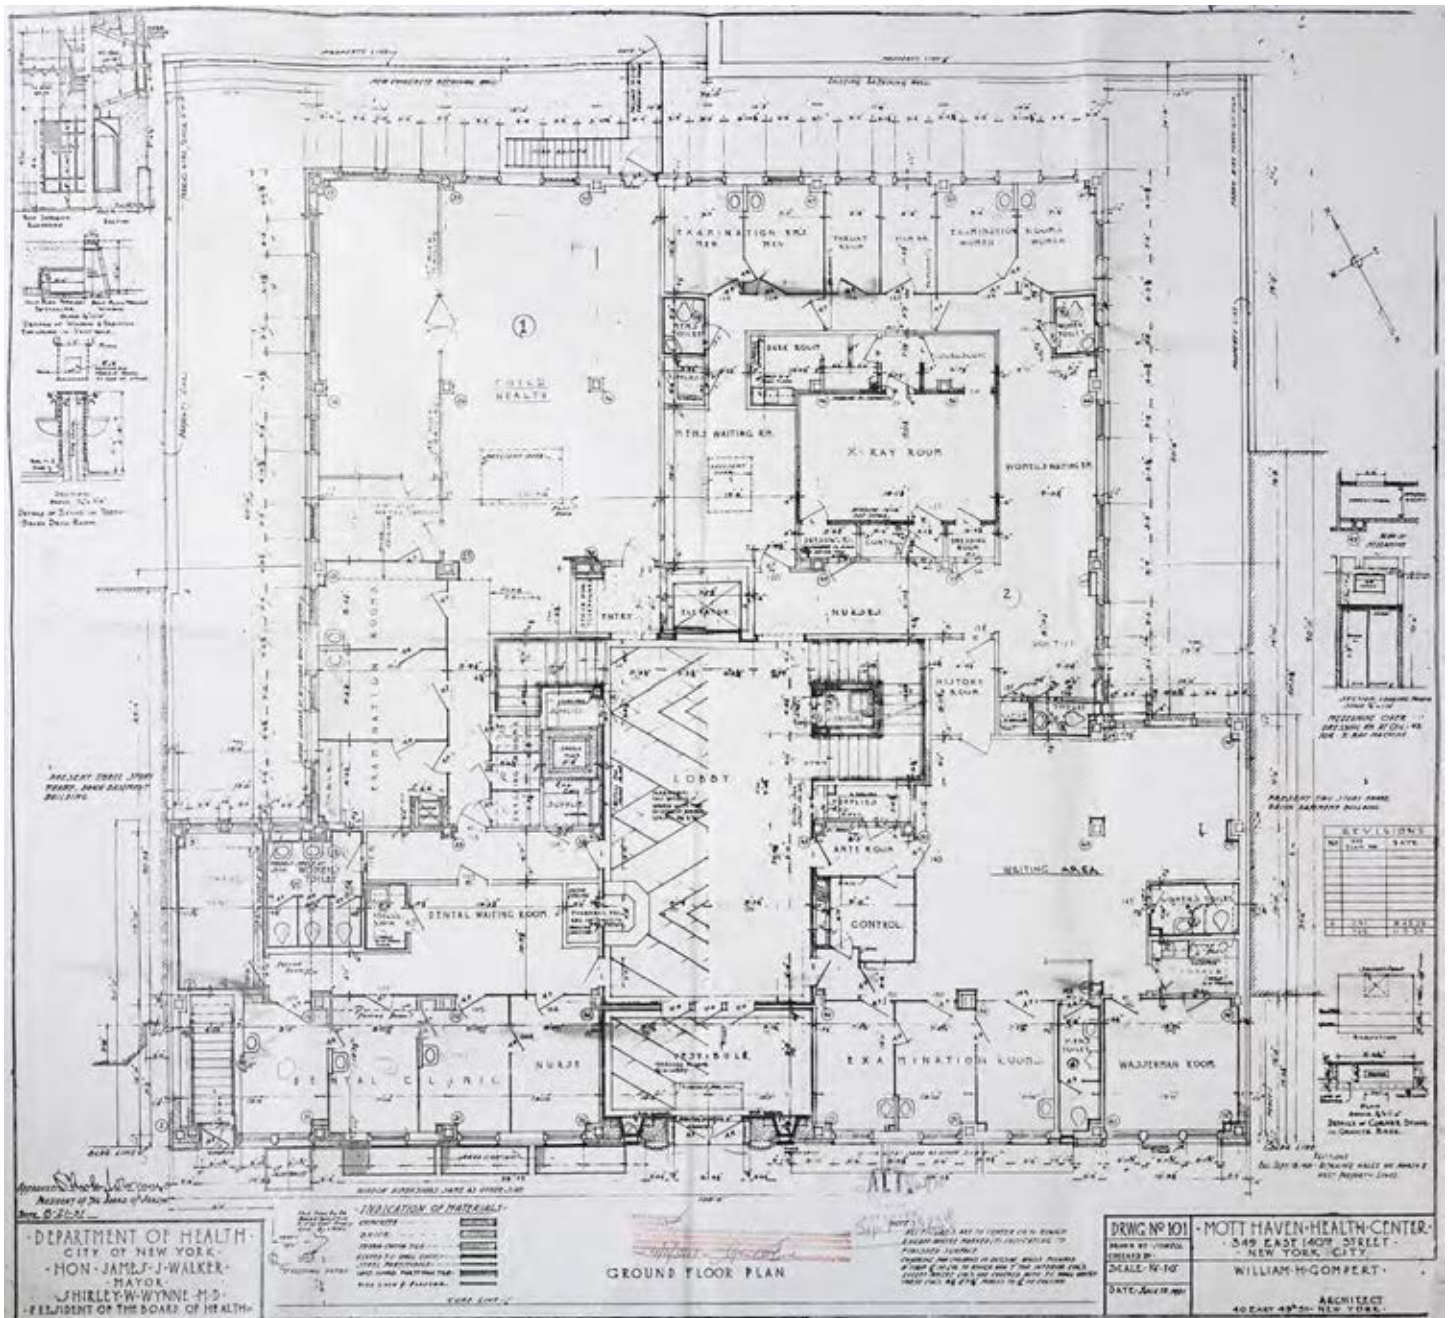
1931 ground floor plan. (Bronx Department of Buildings)
